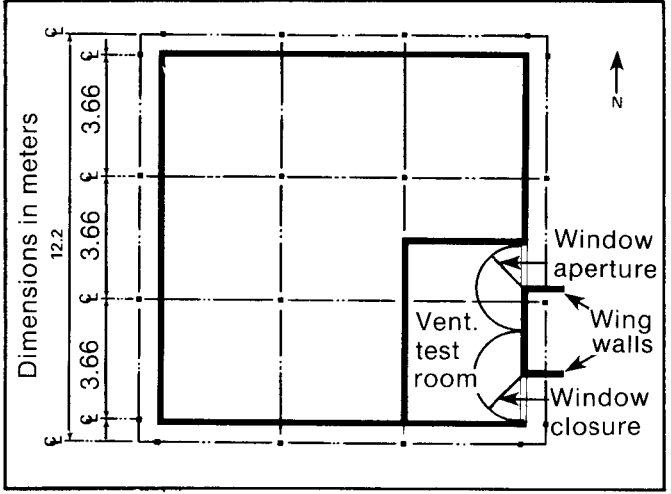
Plan View of FSEC Passive Cooling Laboratory (PCL) Showing Location of Test Room and Wing Walls
